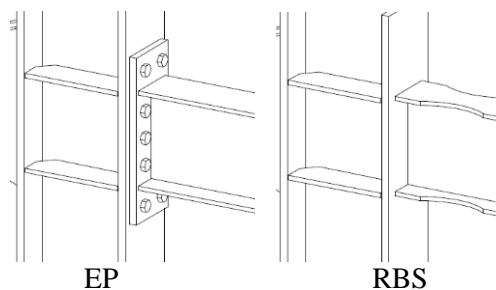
View of connections: extended end-plate connections (left); reduced beam section connection (right)
